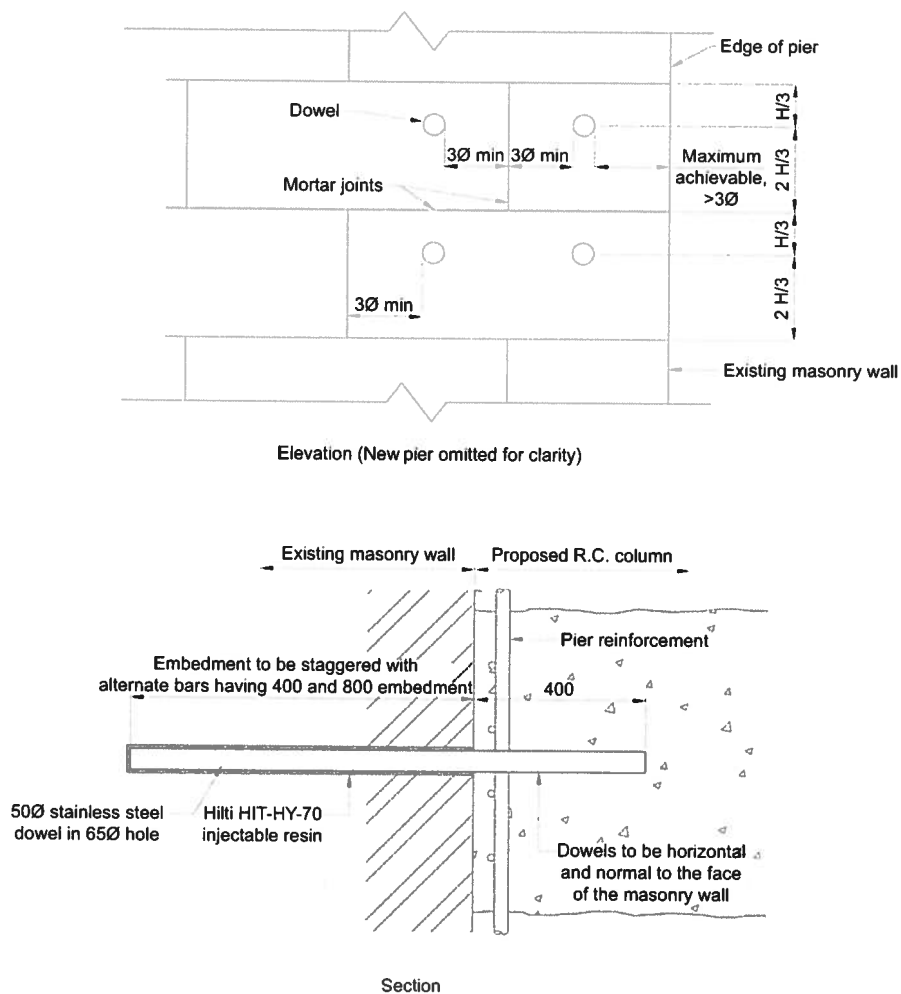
Dowel detail. R.C. = reinforced concrete (dimensions in mm)
